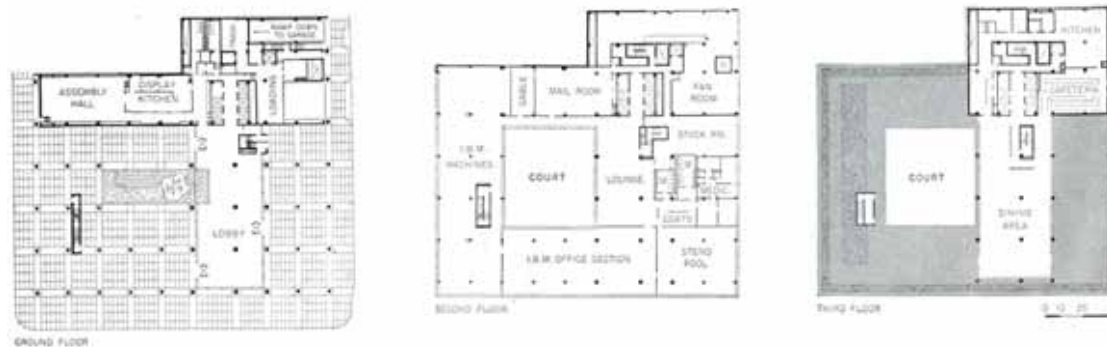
Lever House plans. Source: Architectural Forum, June 1952
